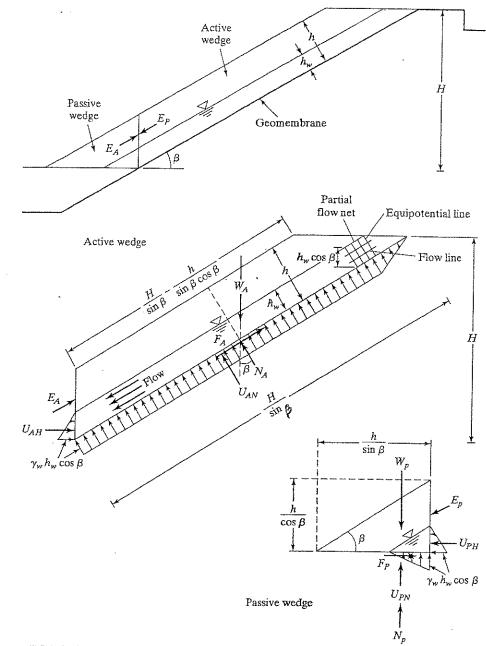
Cross Section of Sand Layer over Geomembrane on Side Slope with Seepage Parallel to Slope.
